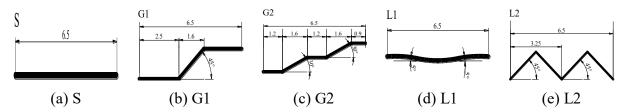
Ends dimension and shape of steel fibers embedded in UHPFRC (unit: mm)
